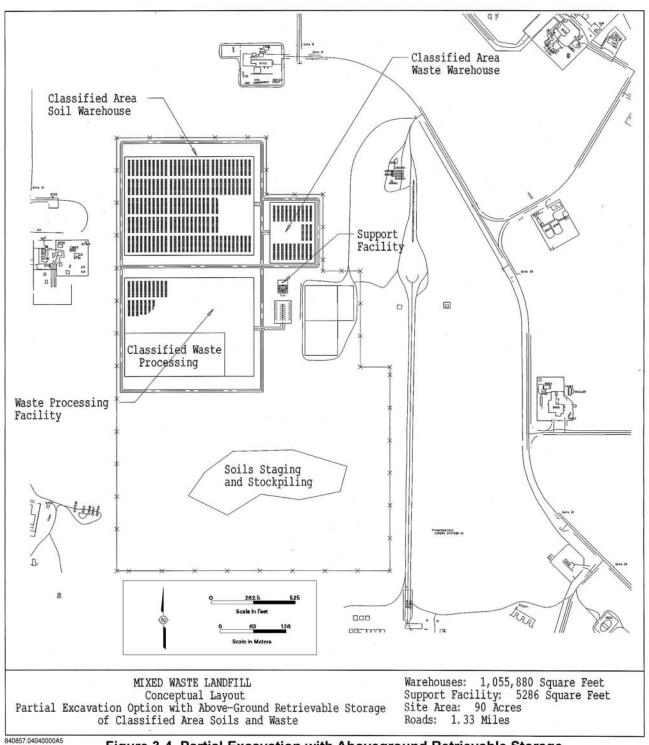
Partial Excavation with Aboveground Retrievable Storage
